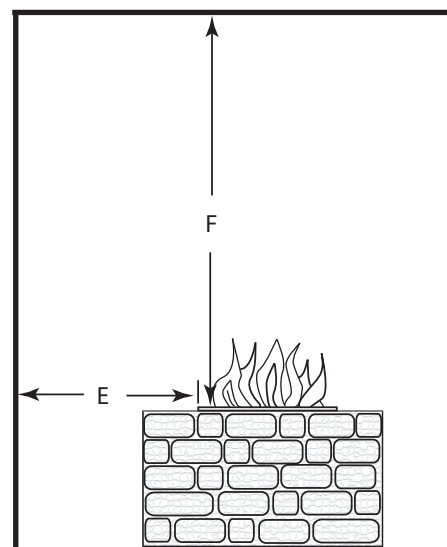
Clearance to Combustibles (Not to be used in an enclosed space)
